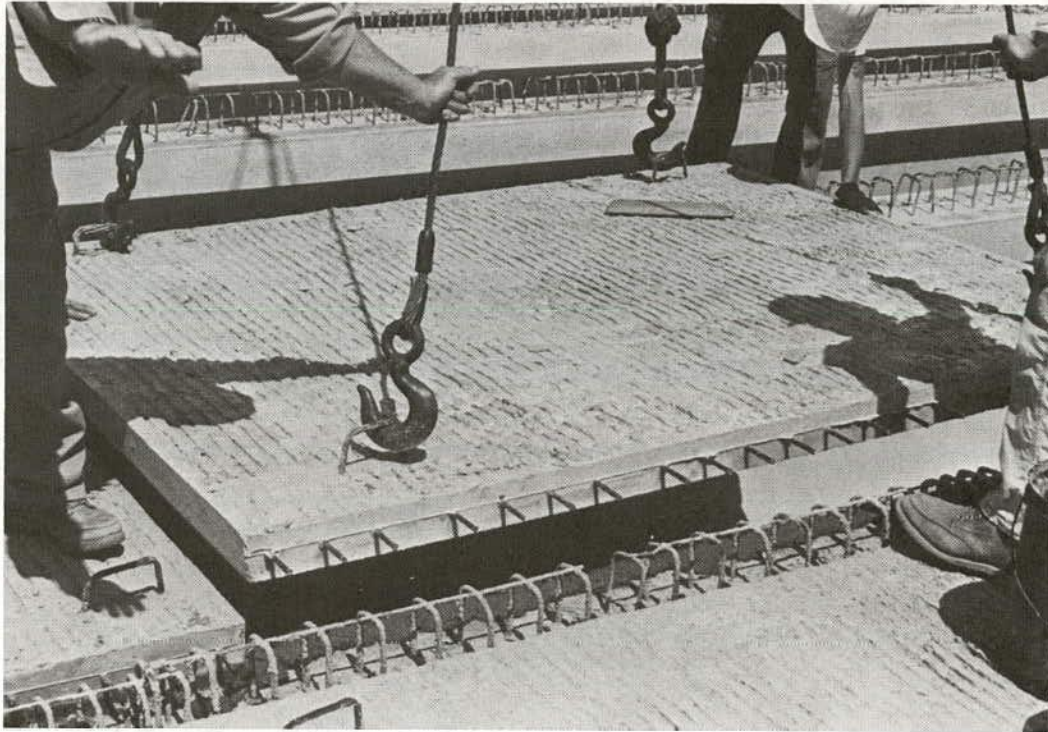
Prestressed subdeck panels are set on a grout bed, which is placed along the top edge of the supporting beam (Virginia Highway and Transportation Research Council photo).
